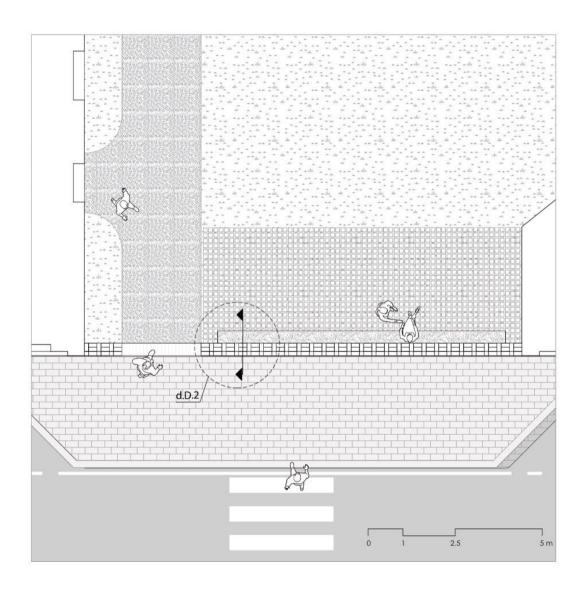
(Opposite page) Detail D.1. Brick wall, plan, design proposal. Produced by the author Figure 3.18. Detail D.2. Brick wall, sections, design proposal. Produced by the author
